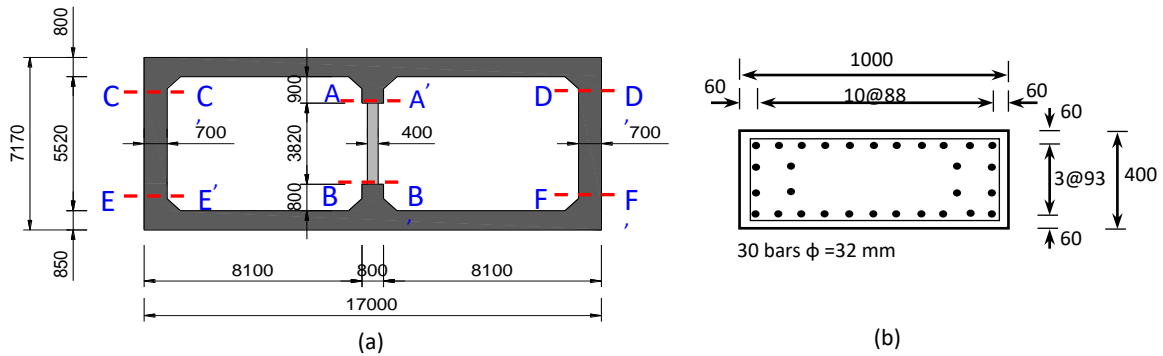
(a) Cross section of the Daikai subway station and (b) reinforcement details of central columns (unit: mm).
